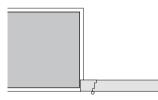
Frame in opening, finished flush (internal and external doors) rebated door leaf flush with frame
